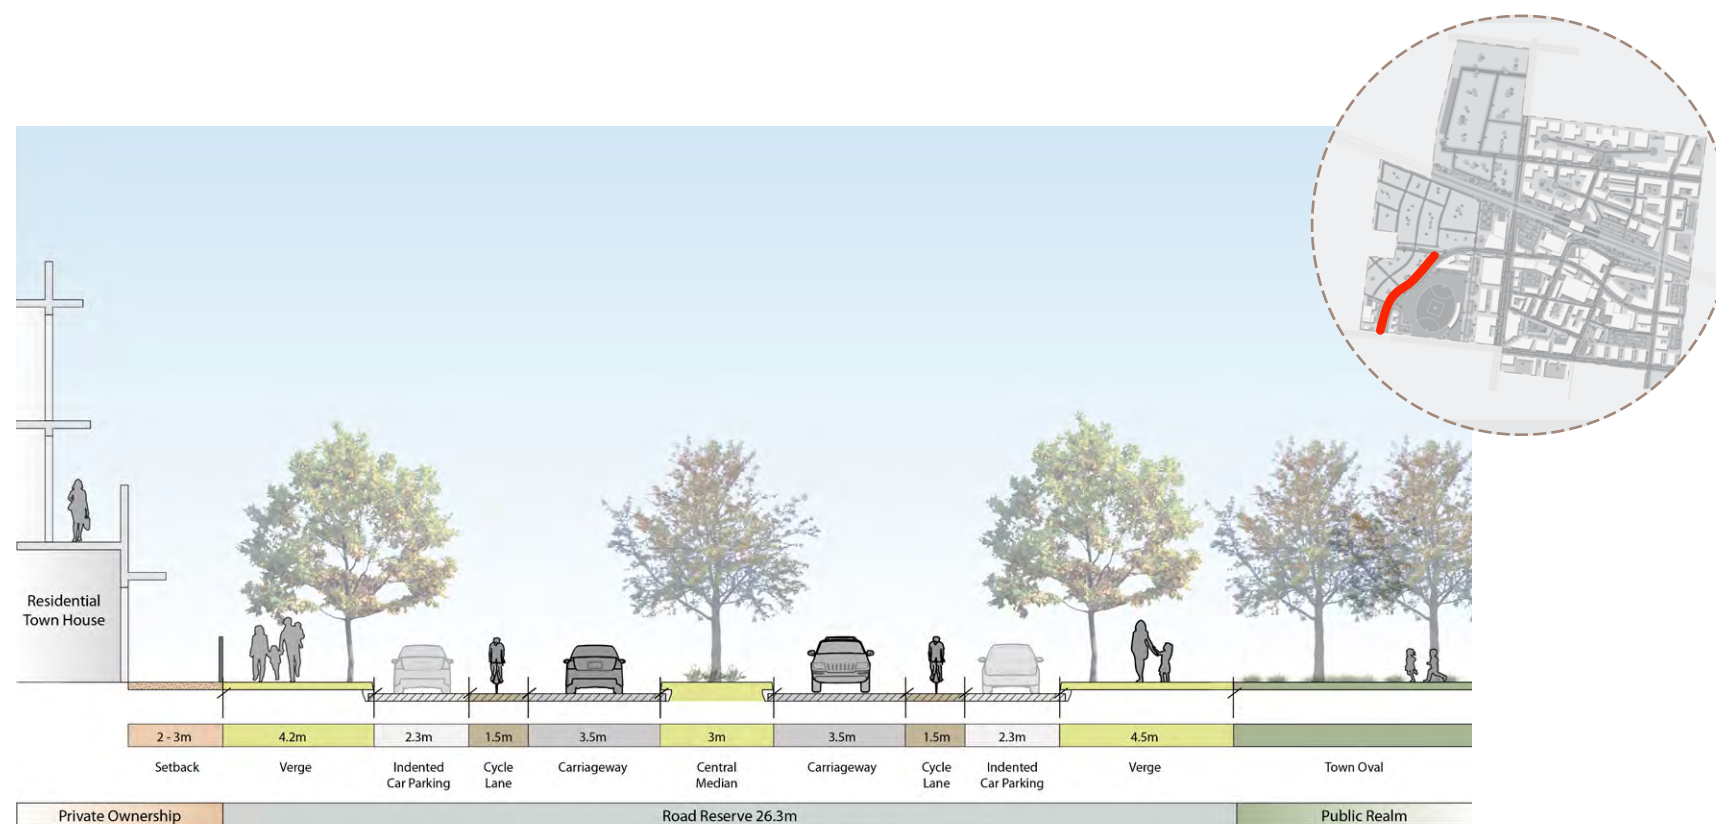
High Street Cross Section (Town Oval to Bridge Road) 26.3m
